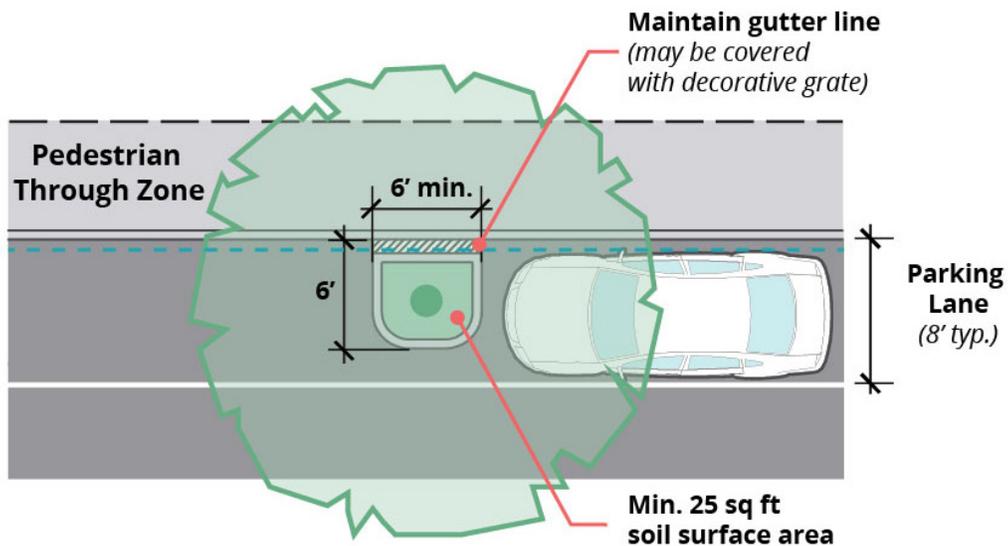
The curb zone can serve as a location for stormwater facilities if a full frontage zone is not available.
